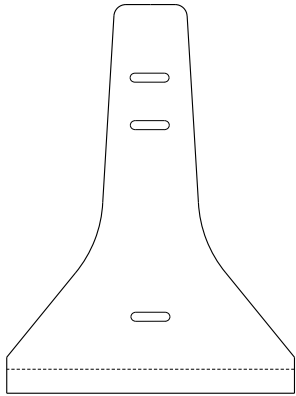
WP Barrier Sec Cell (Barriers and Rails Library)
